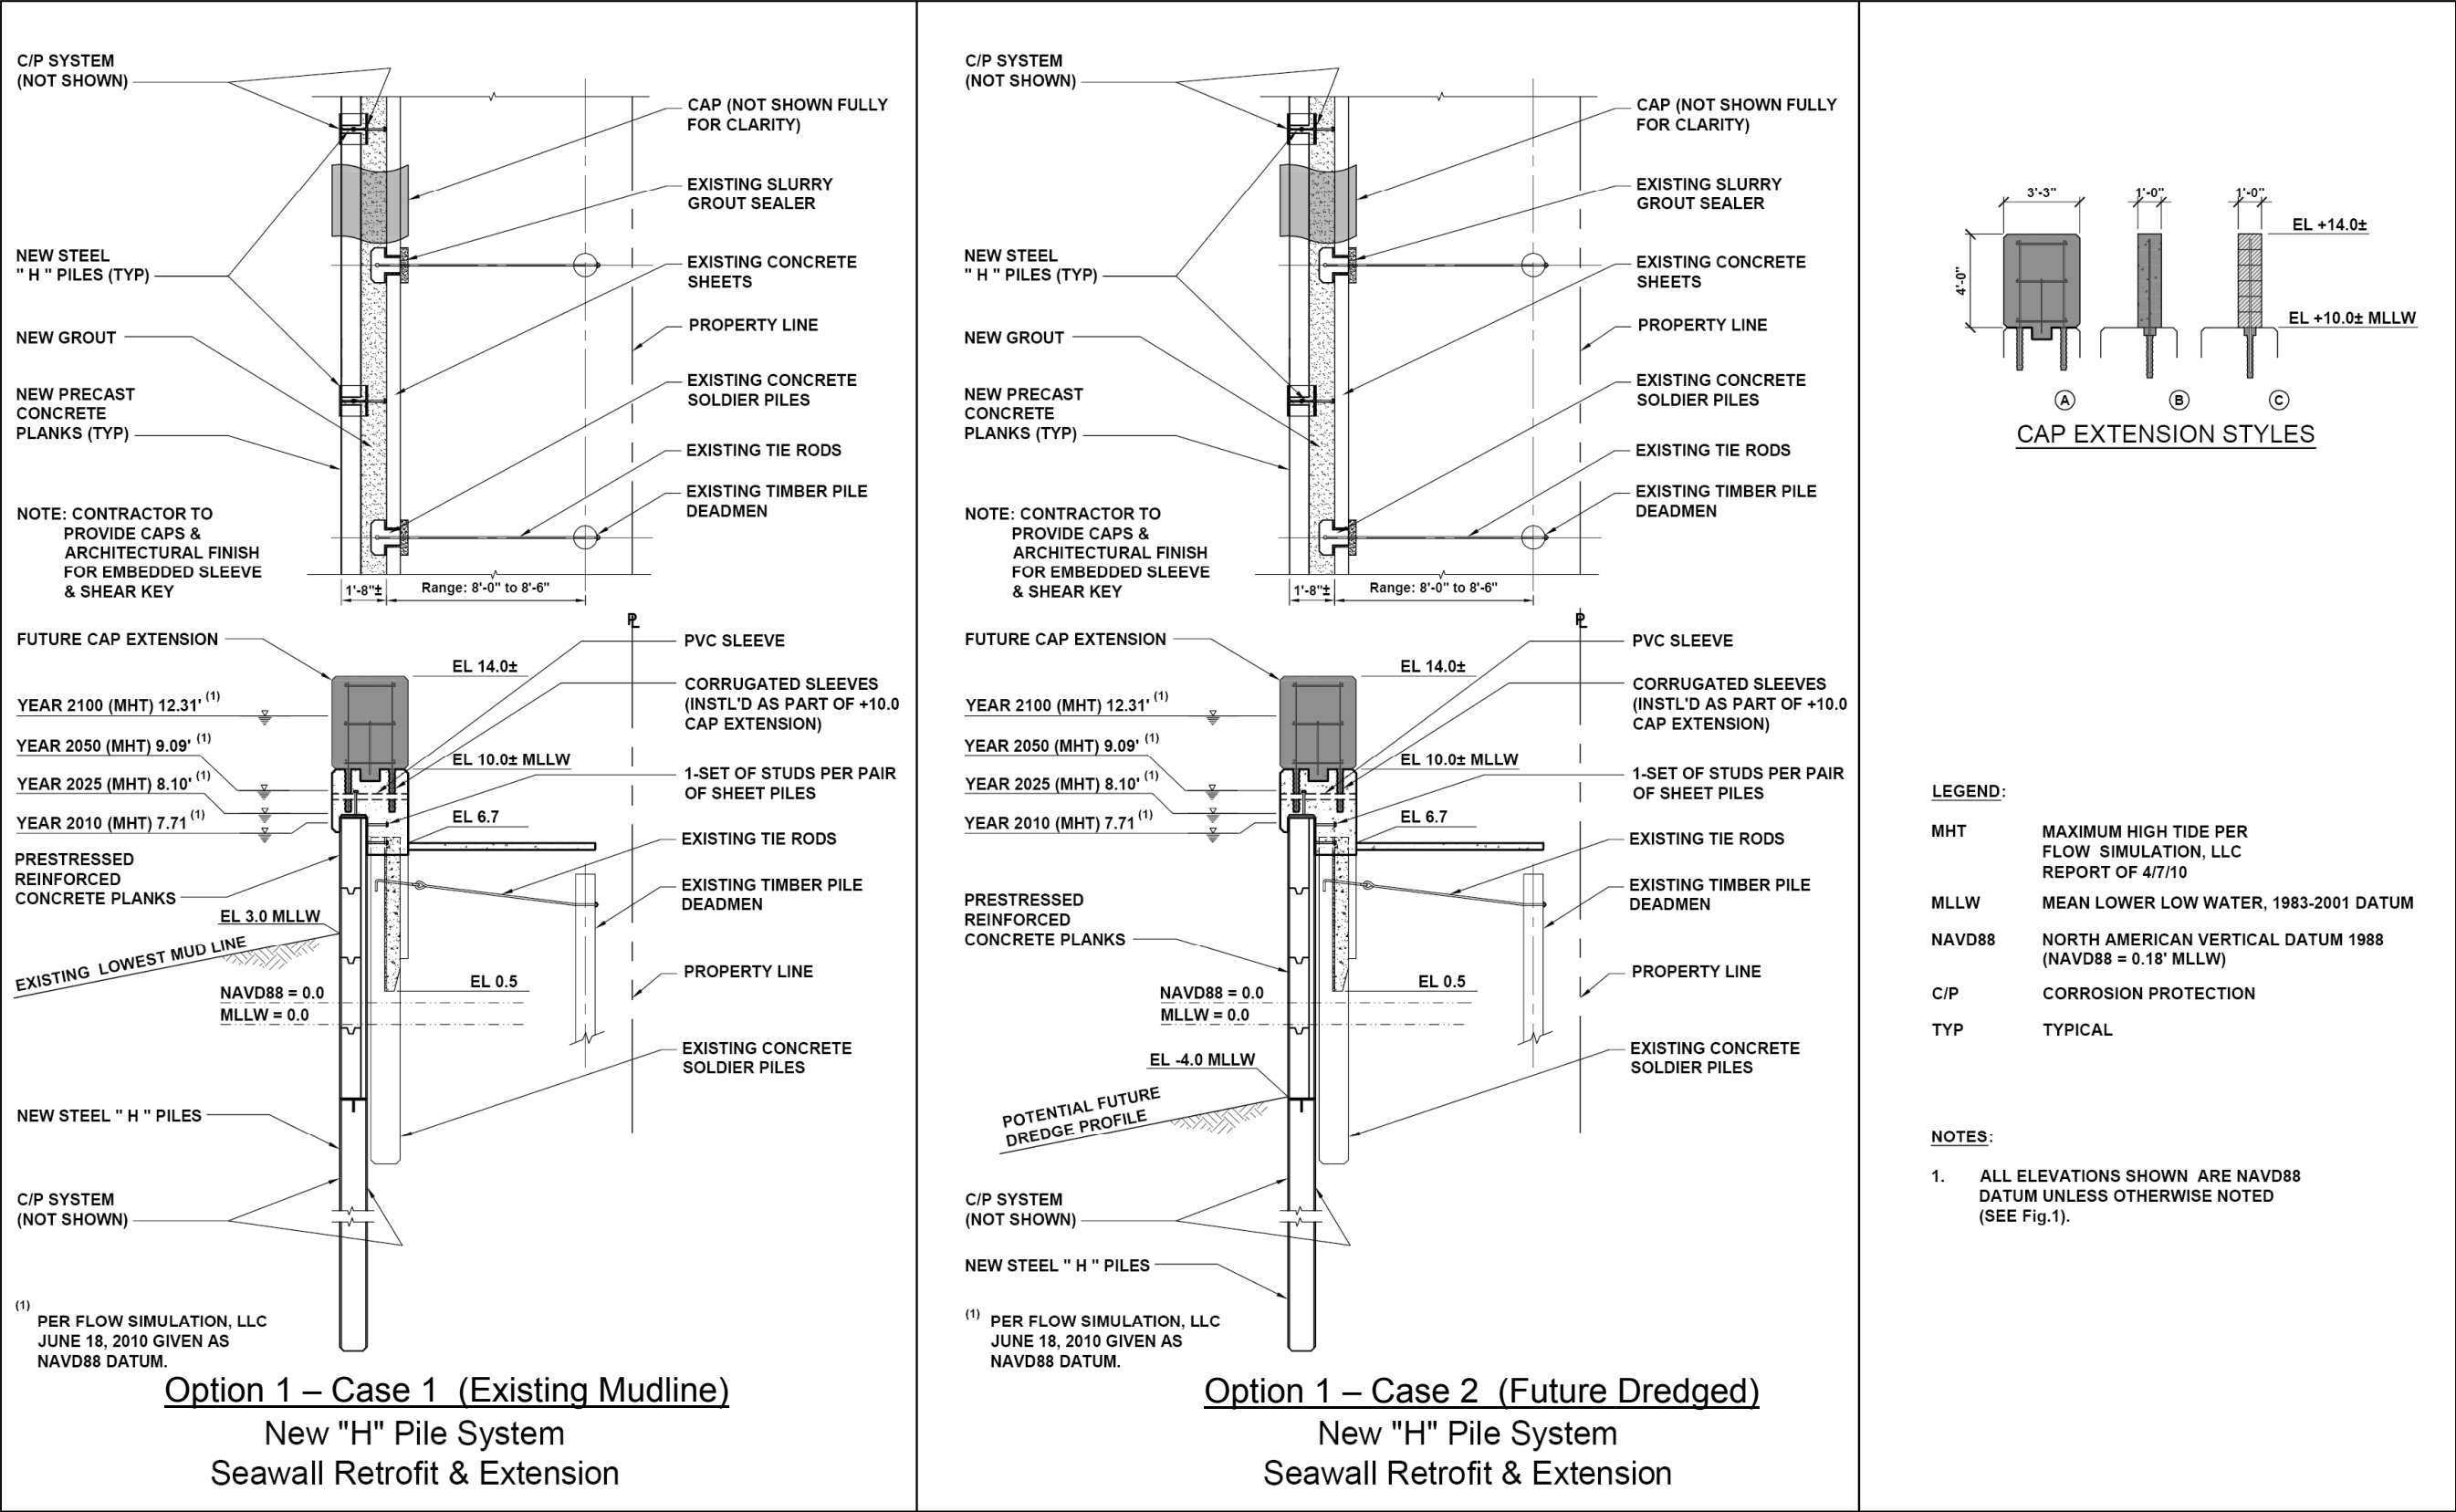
New "H" Pile System Seawall Retrofit and Extension
